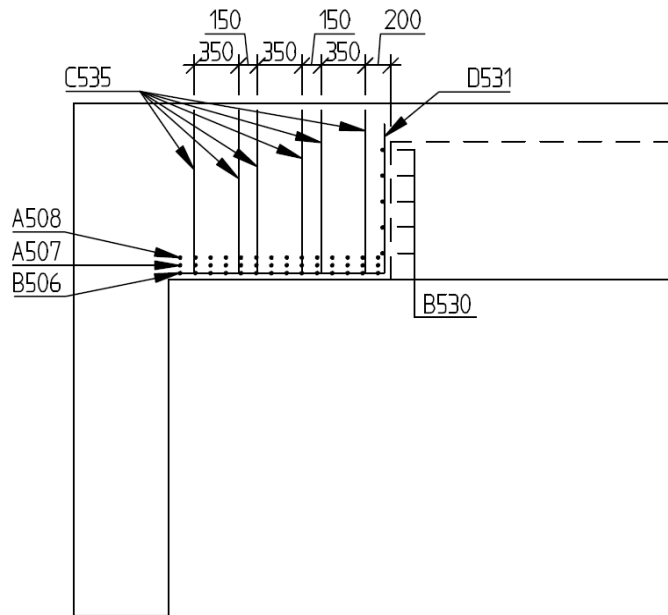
Section B-B of reinforcement arrangement in the FE-model, [mm].
